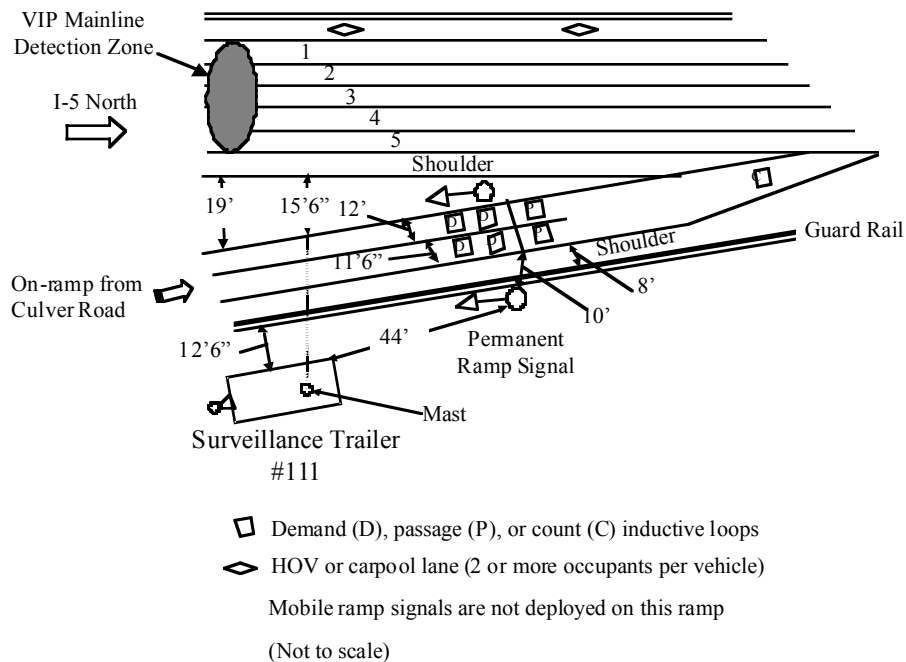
Trailer configuration at Culver Drive evaluation site
